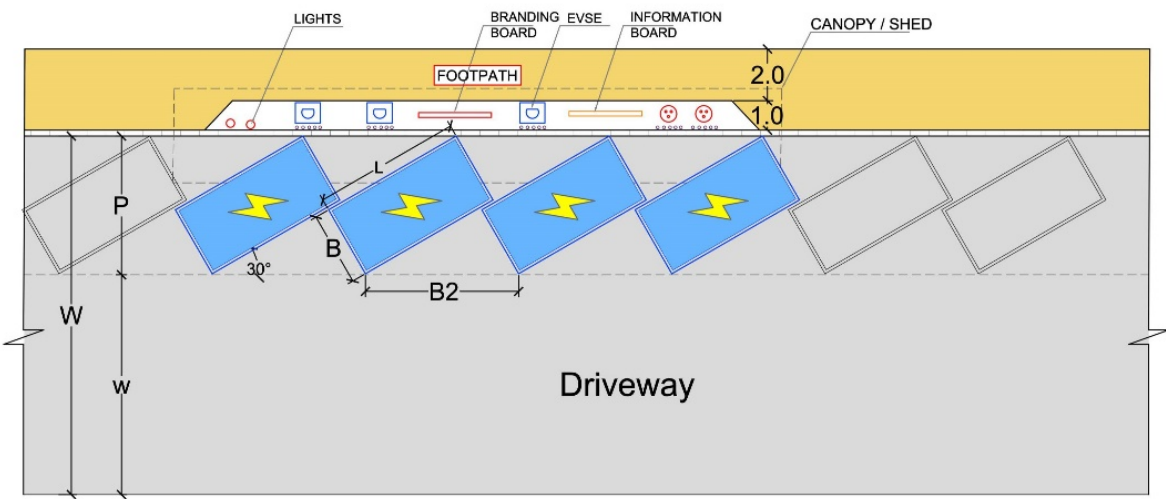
Diagonal On-Street Charging Layout (30-degree angle)
